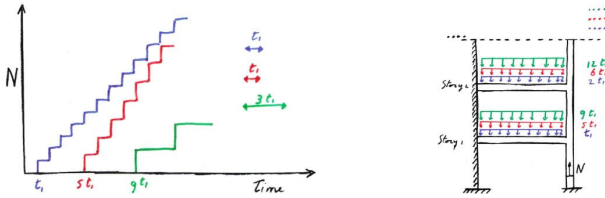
Staged construction of the timber structure (blue line), concrete toppings (red line) and finishes (green line)
